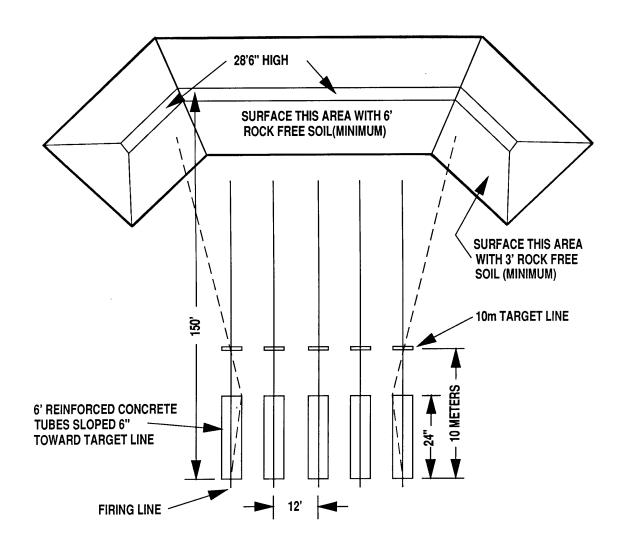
M60 Machine Gun, 10 Meter, Tube Range.
